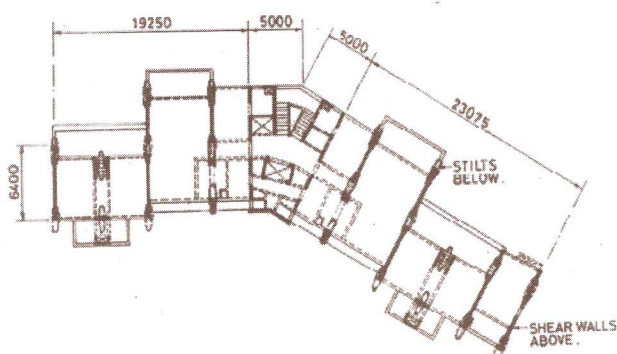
A: TYPICAL FLOOR FRAMING - 22 STOREYED APARTMENT BUILDING.
